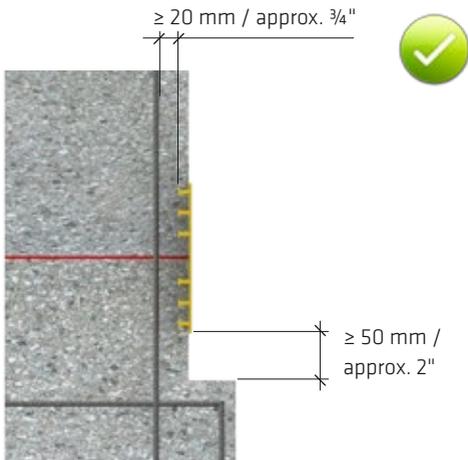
Waterproofing of base slab wall-construction joint with an external waterbar
